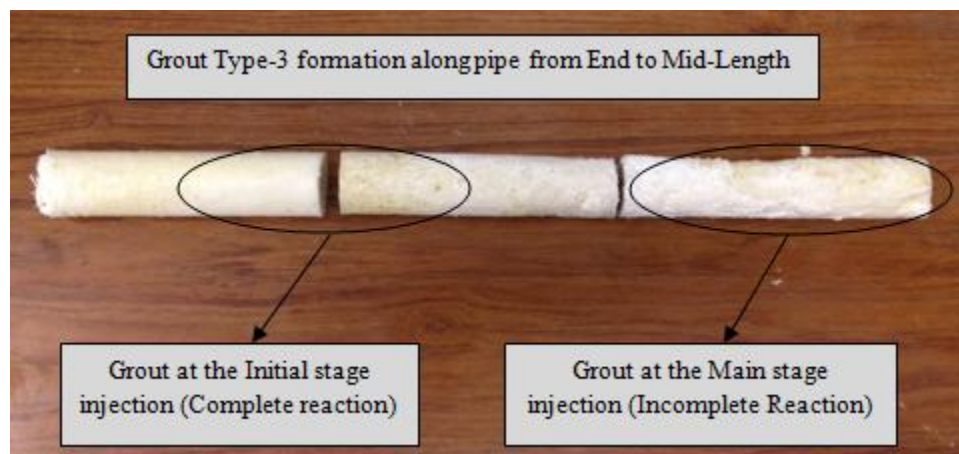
The structure of the grout along the 5 feet long pipe grouted with Grout-3
